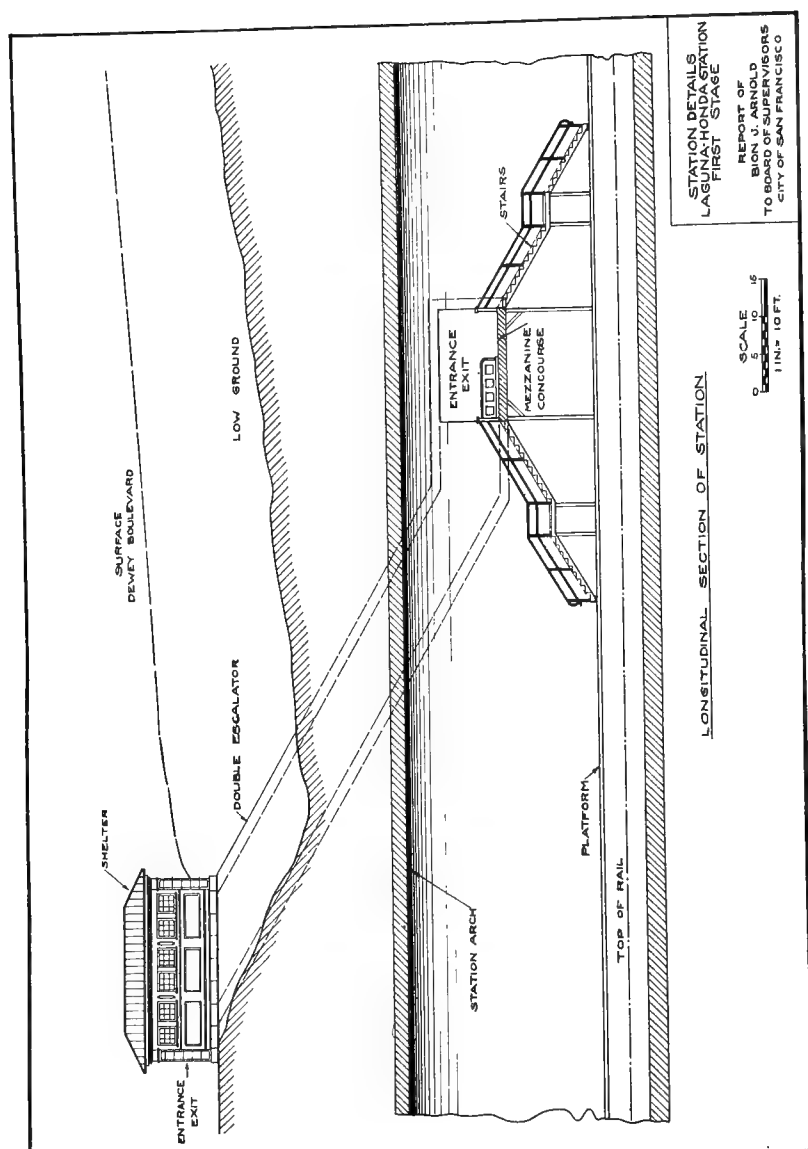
LAGUNA HONDA STATION, FIRST STAGE.
